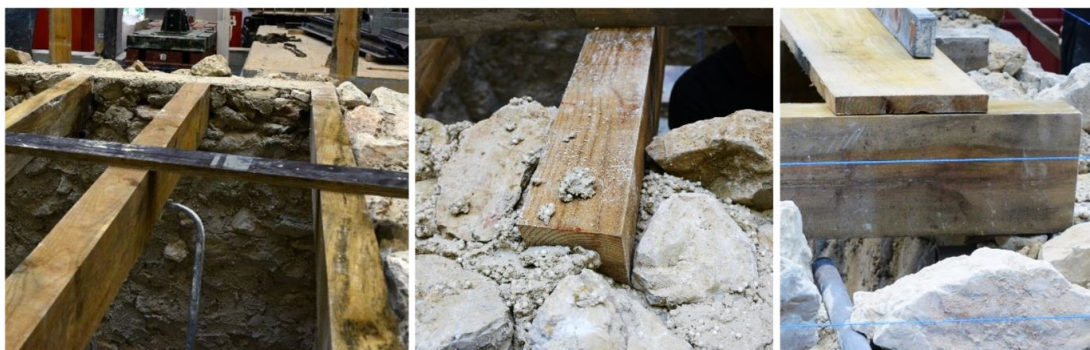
Beam supports at the 1st floor of Unit 2 of the masonry aggregate specimen.
